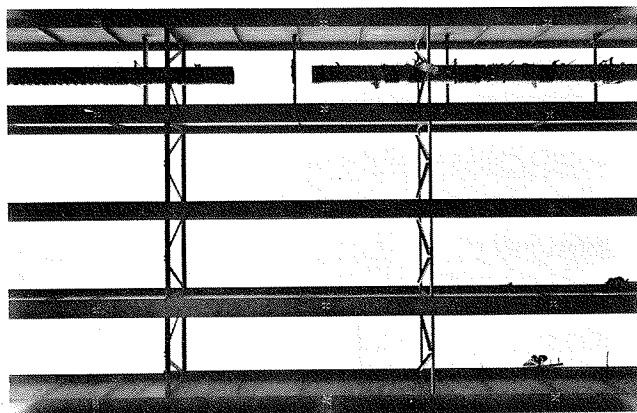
Fifth Street Bridge after placement of steel beams.
